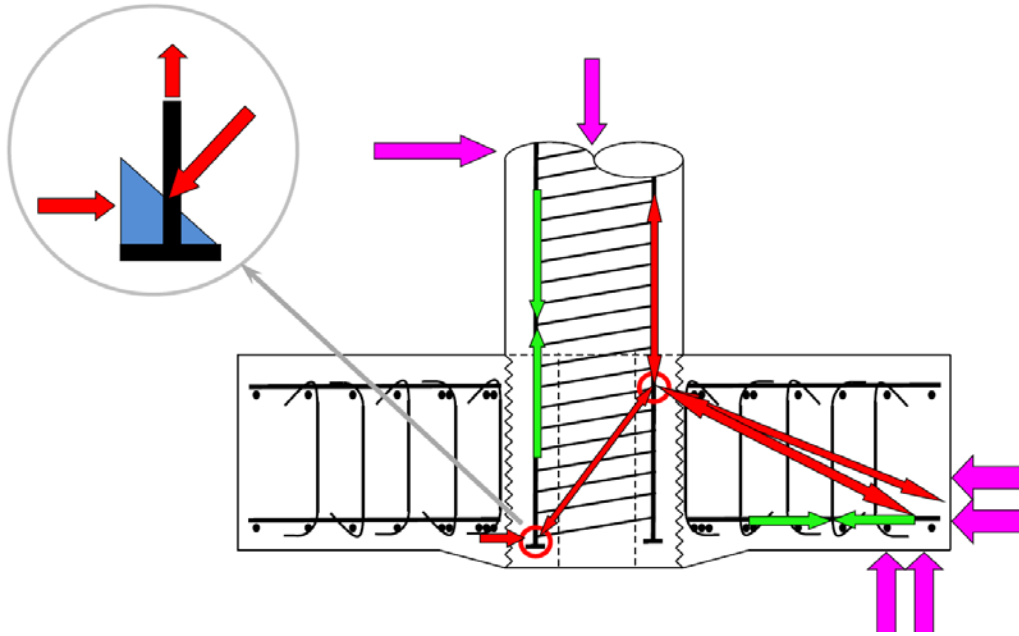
Diagram. Precast column strut-and-tie mechanism.
